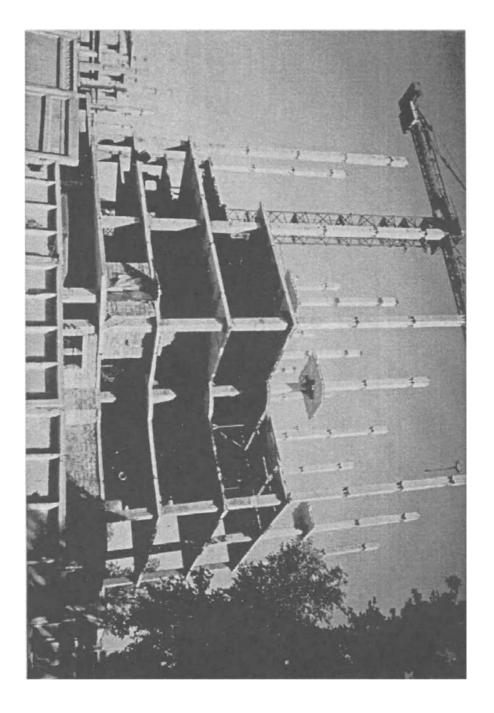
Typical reinforced concrete frame building construction in Central Asia.
